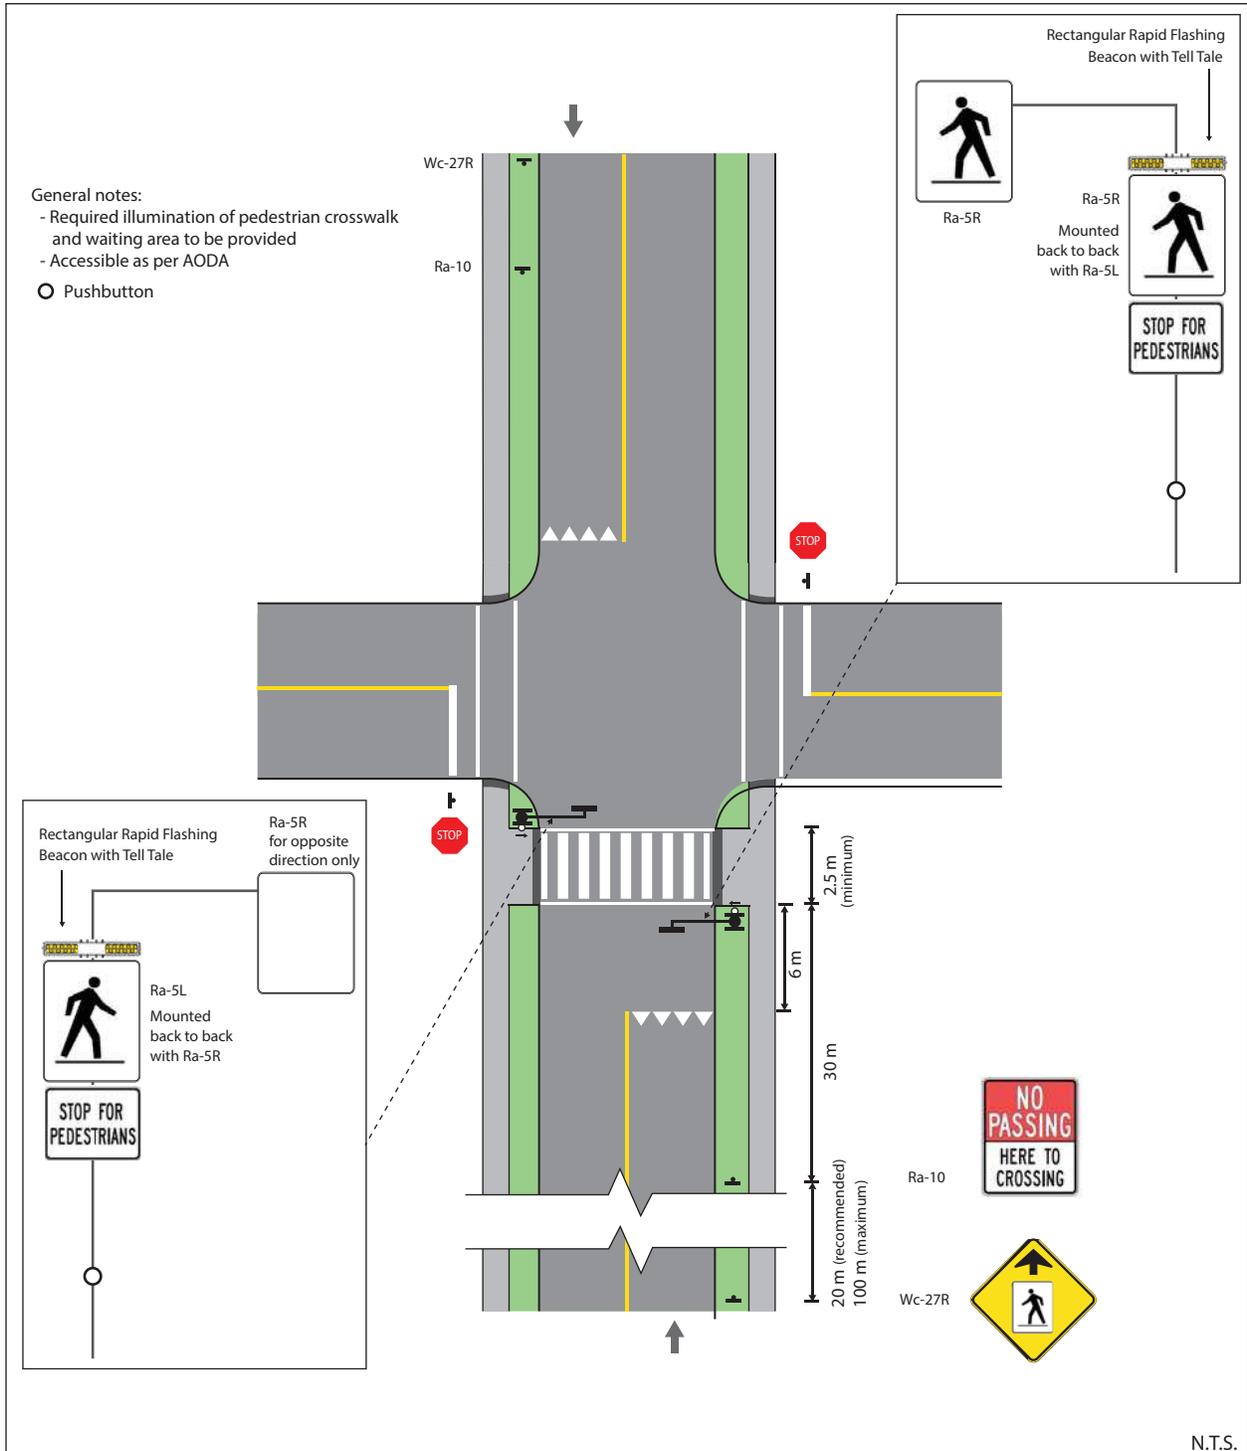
Pedestrian Crossover Level 2 Type B – Intersection (2-way)
